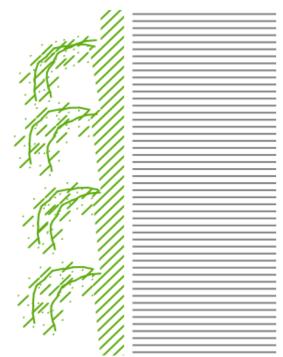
Section of hanging pocket living wall system (Author, 2016)
